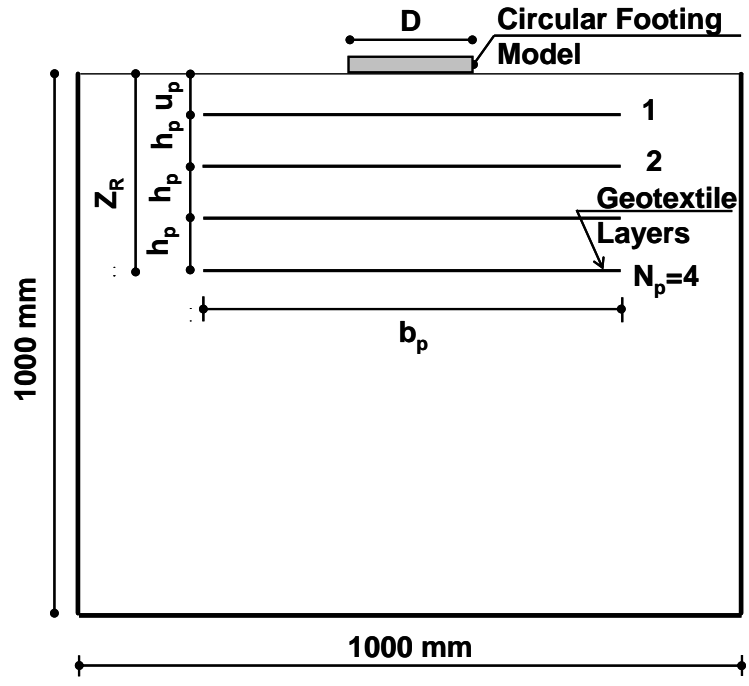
Layout of the multi-layered planar geotextile-reinforced installation.
